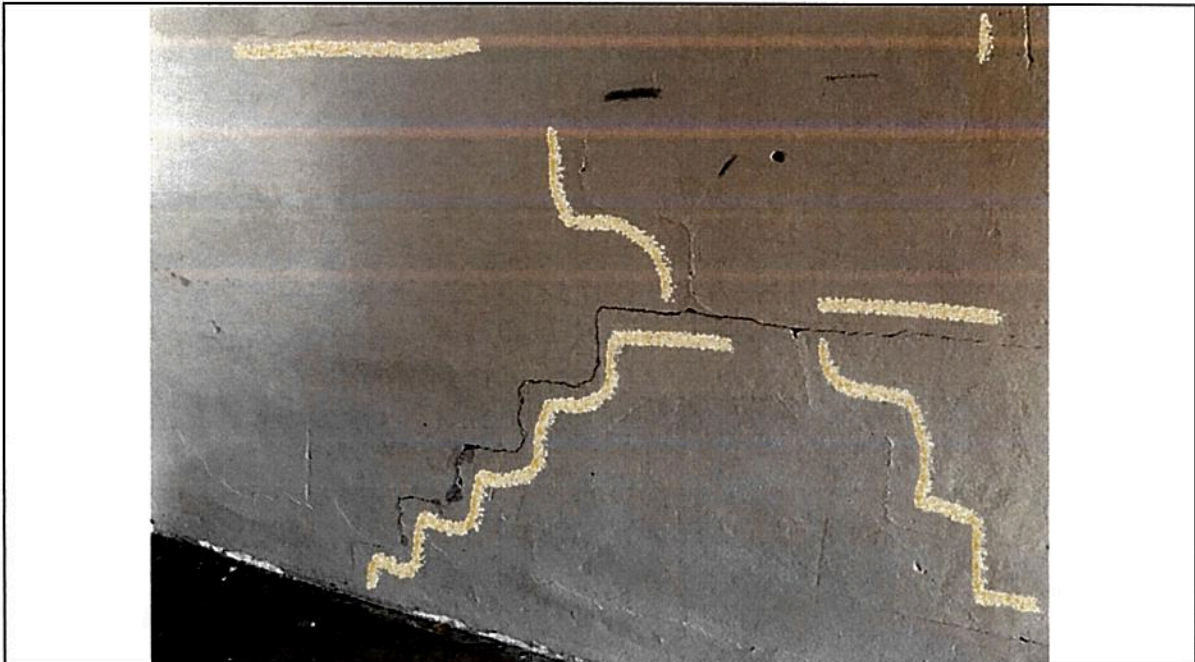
Differential settlement condition at the SE Stairs area noticeable at the building expansion joint (opening), adjacent CMU walls cracking, floor elevation difference and ceiling separations and cracks at the stairs and building joint.
